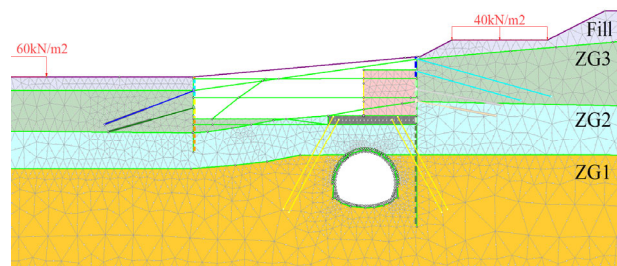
Detail of the finite element mesh at the last stage of the excavation.
